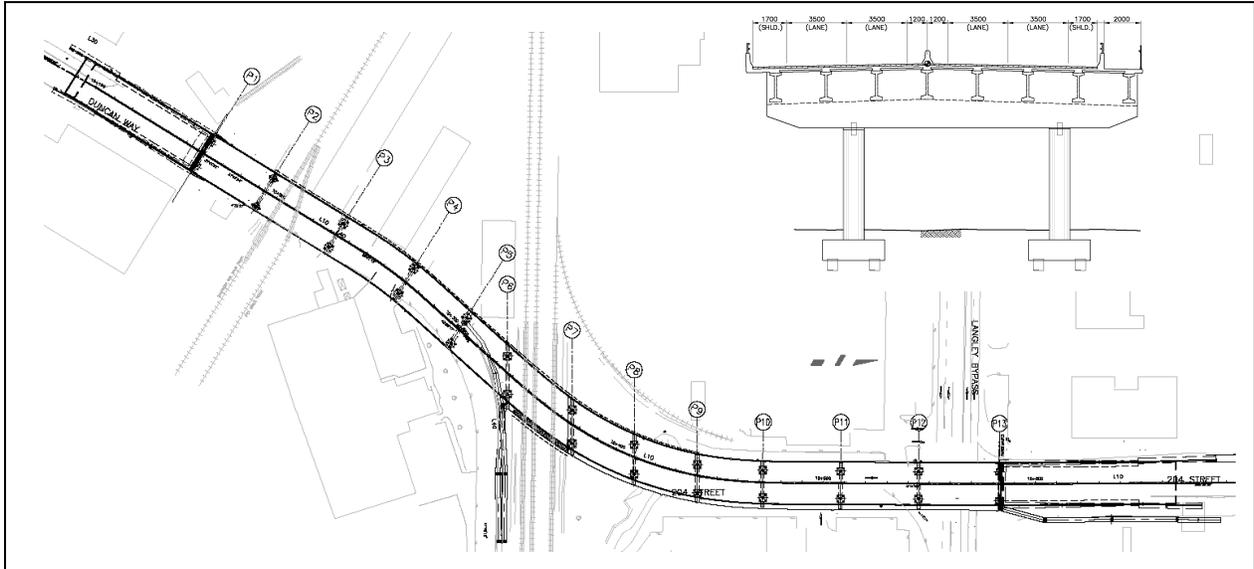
Overall plan and typical bent cross-section for the 204<sup>th</sup> Street Viaduct.
